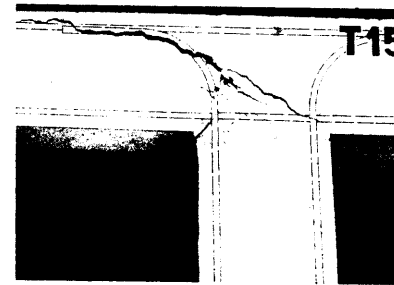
Specimen T15 after Diagonal Tension Crack Failure Caused by Bending Moment (Reinforcement Drawn on Surface)
